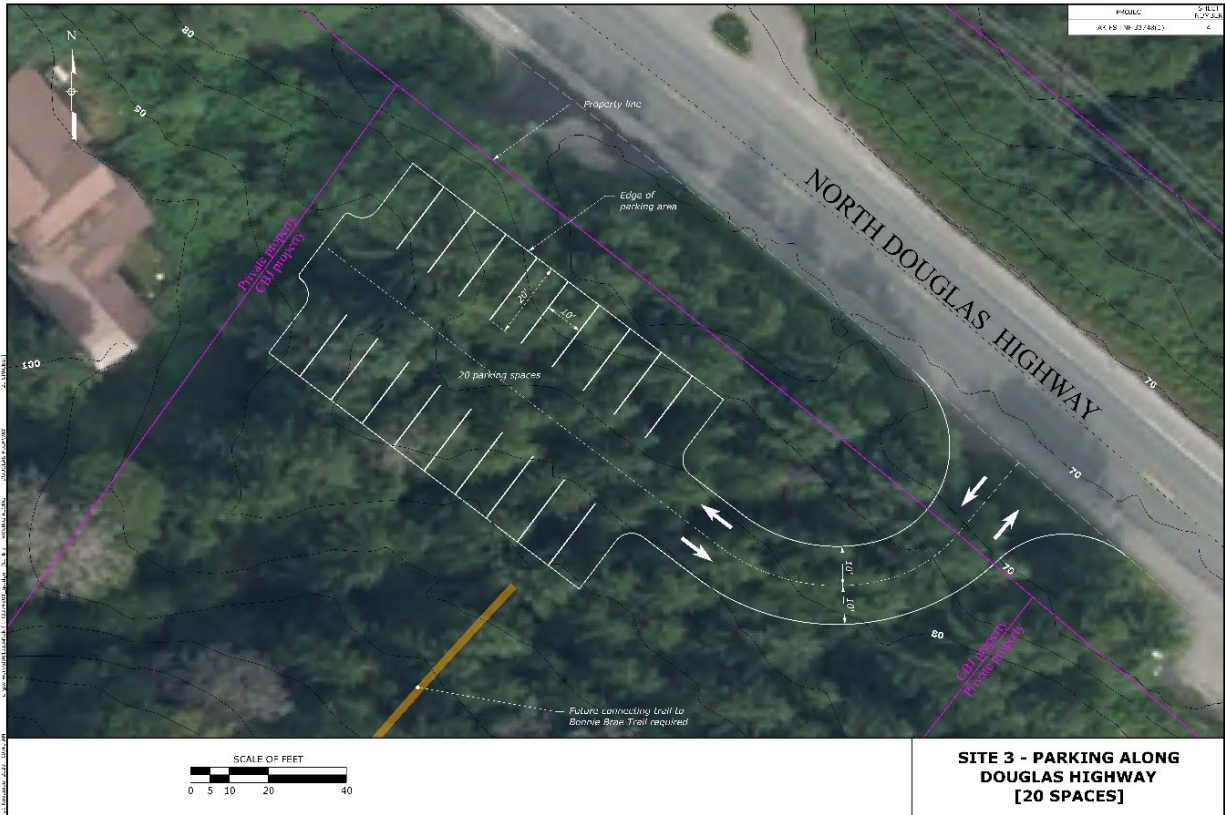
Site 3 located off North Douglas Highway with up to 20 parking spaces
